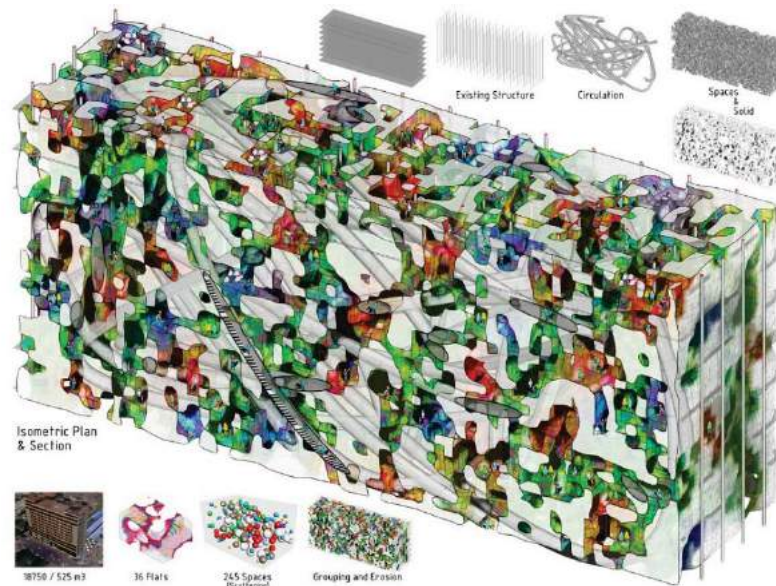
Pardis Zarghami and Hossam Elbrashi – Isometric plan and section.
